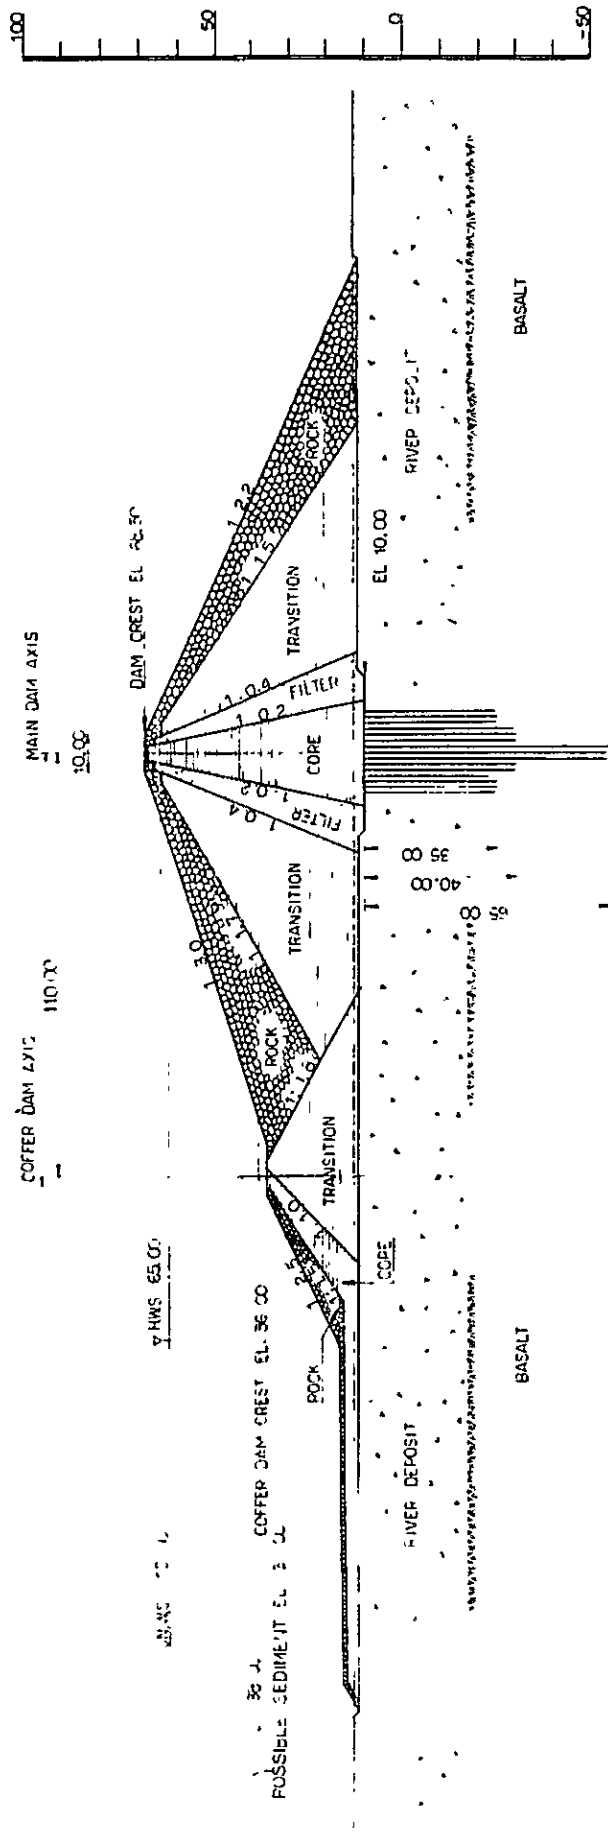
TYPICAL CROSS SECTION OF DAM (TYPE -C SOLE-TANCHE CURTAIN-GROUTING)
